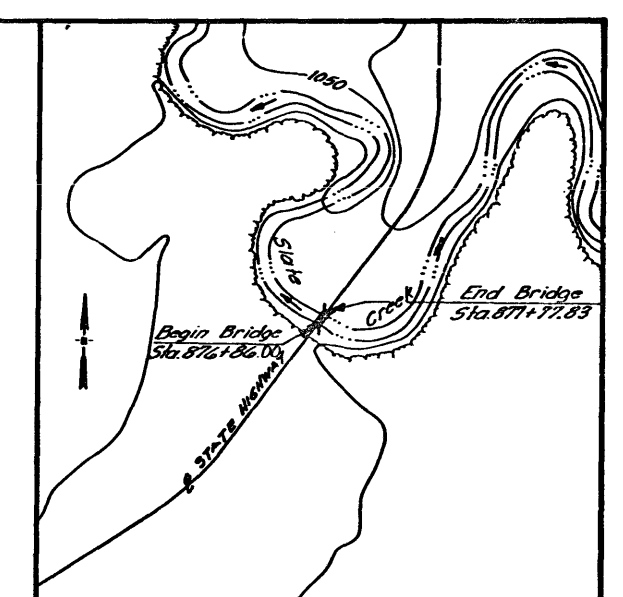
PLAN-PROFILE B.P.R. STANDARD
